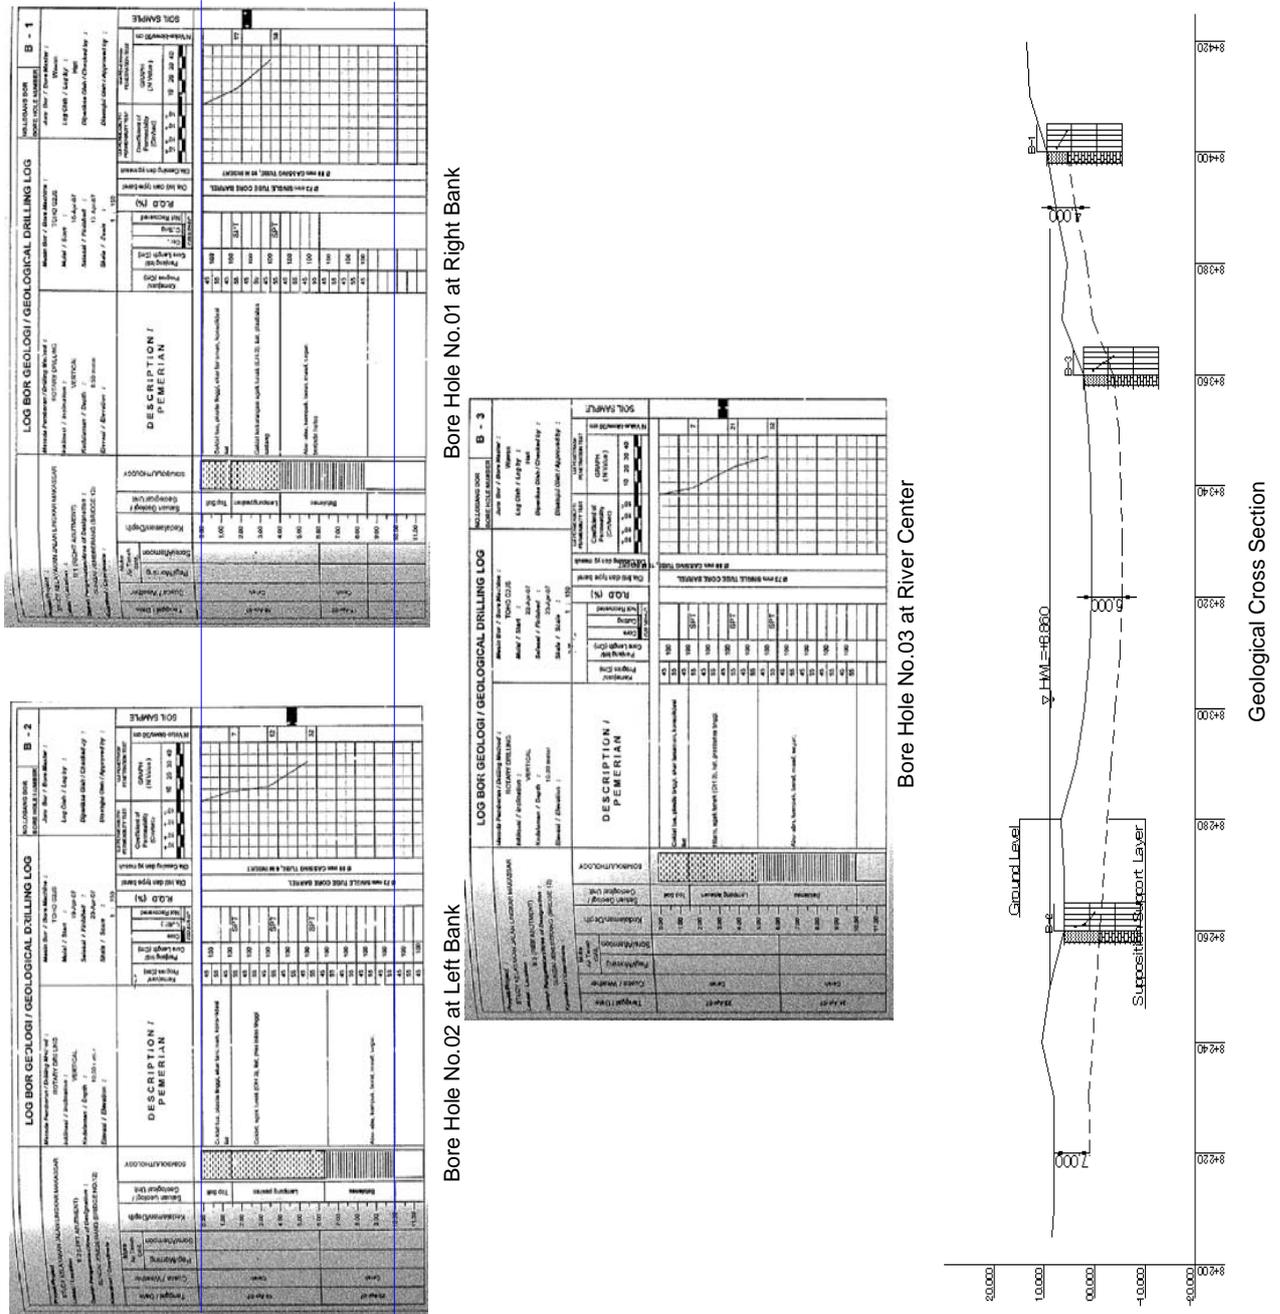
Boring Logs and Geological Cross Section For Jeneberang No.1 Bridge on Mamminasa Bypass
